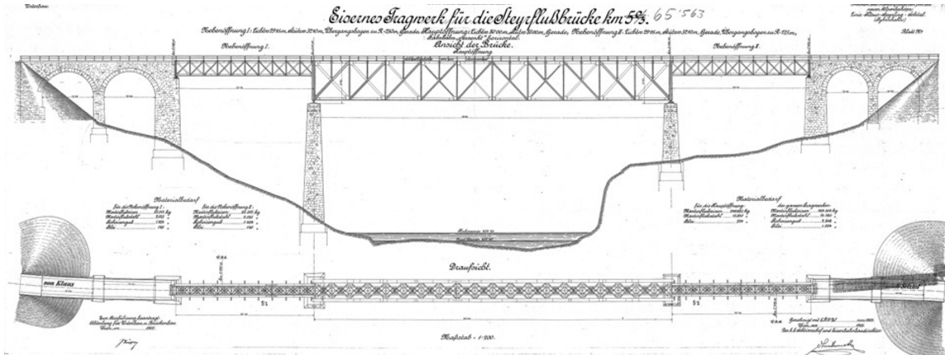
Longitudinal cut of existing Steyrthal Bridge over river Steyr.
